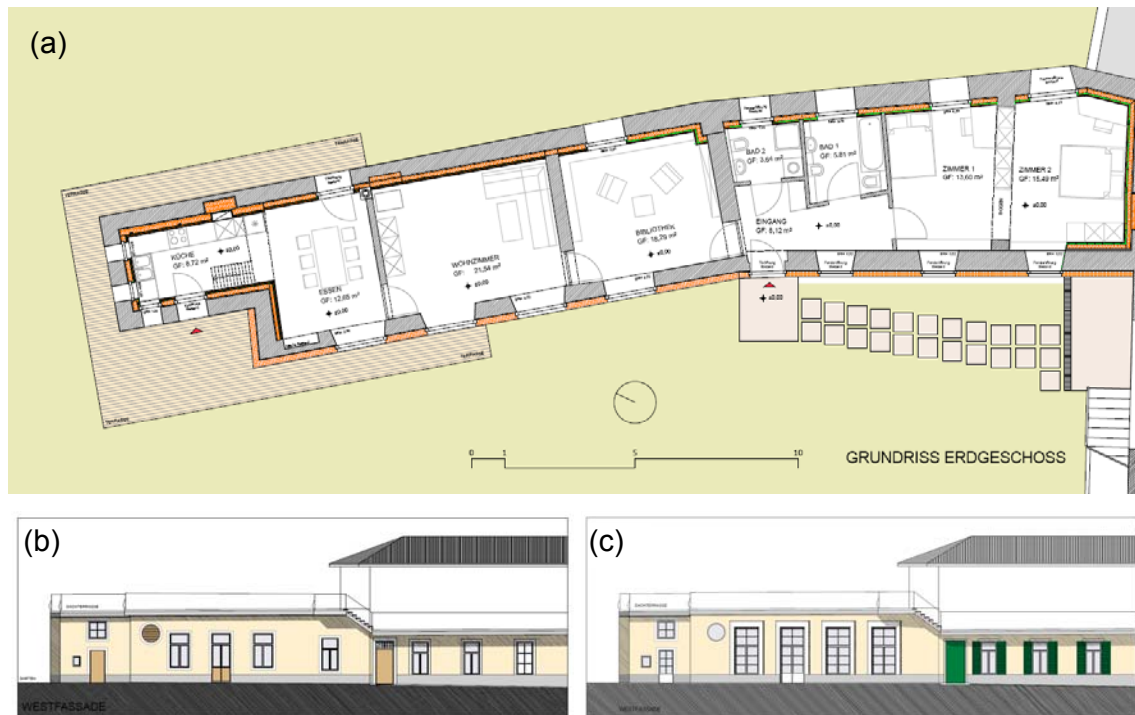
Plan view (a) and western facade (b) before & (c) after refurbishment.
